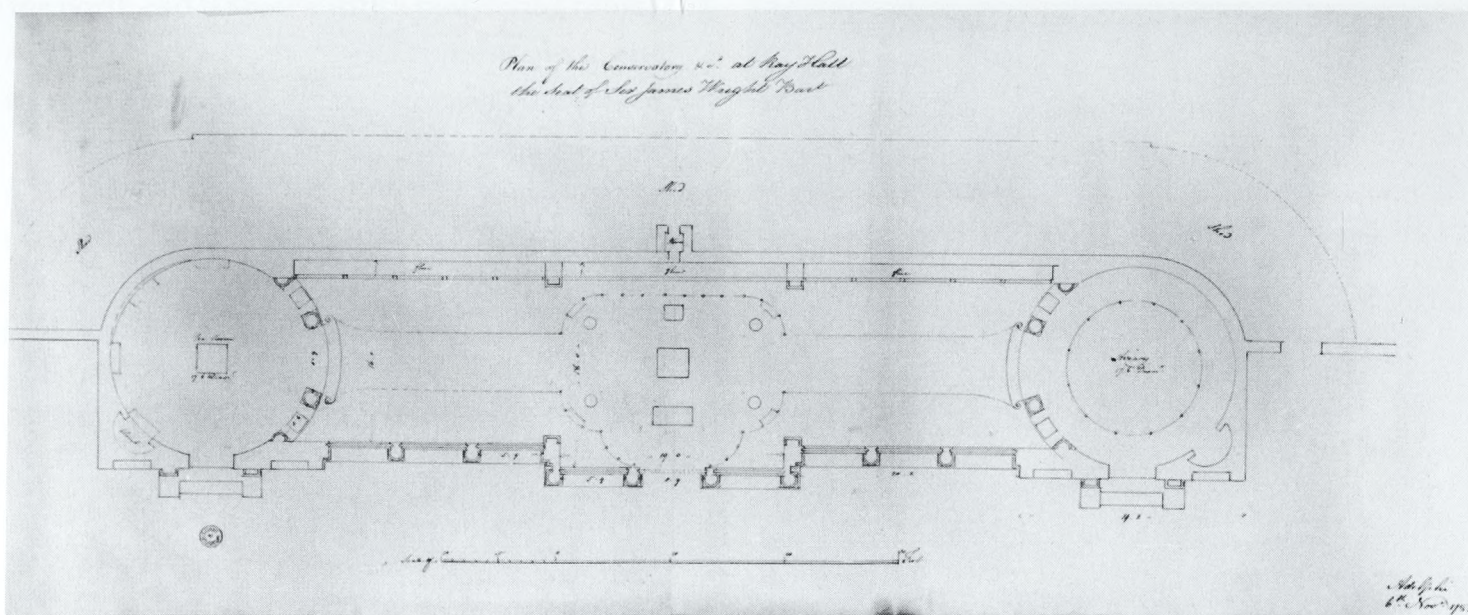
Robert Adam, plan, proposed conservatory, Ray Hall, November 1782. *Sir John Soane's Museum*.
